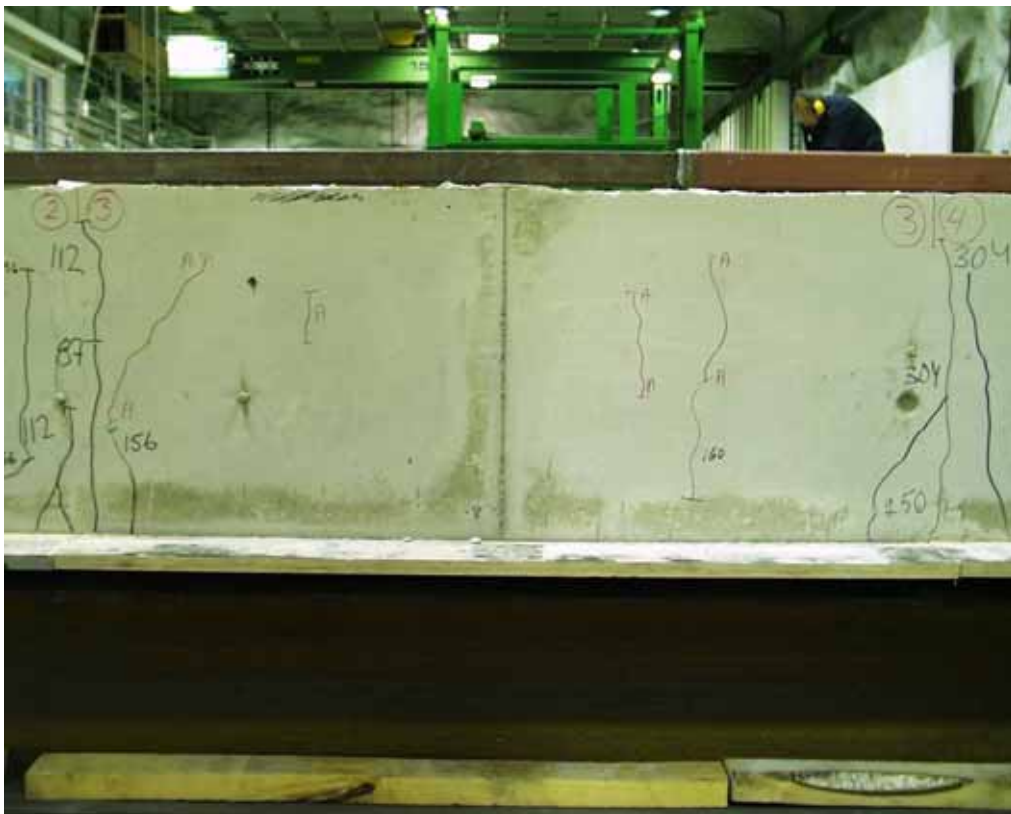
Western end beam. Cracks in cast in-situ concrete at the end of slabs 2-4.
